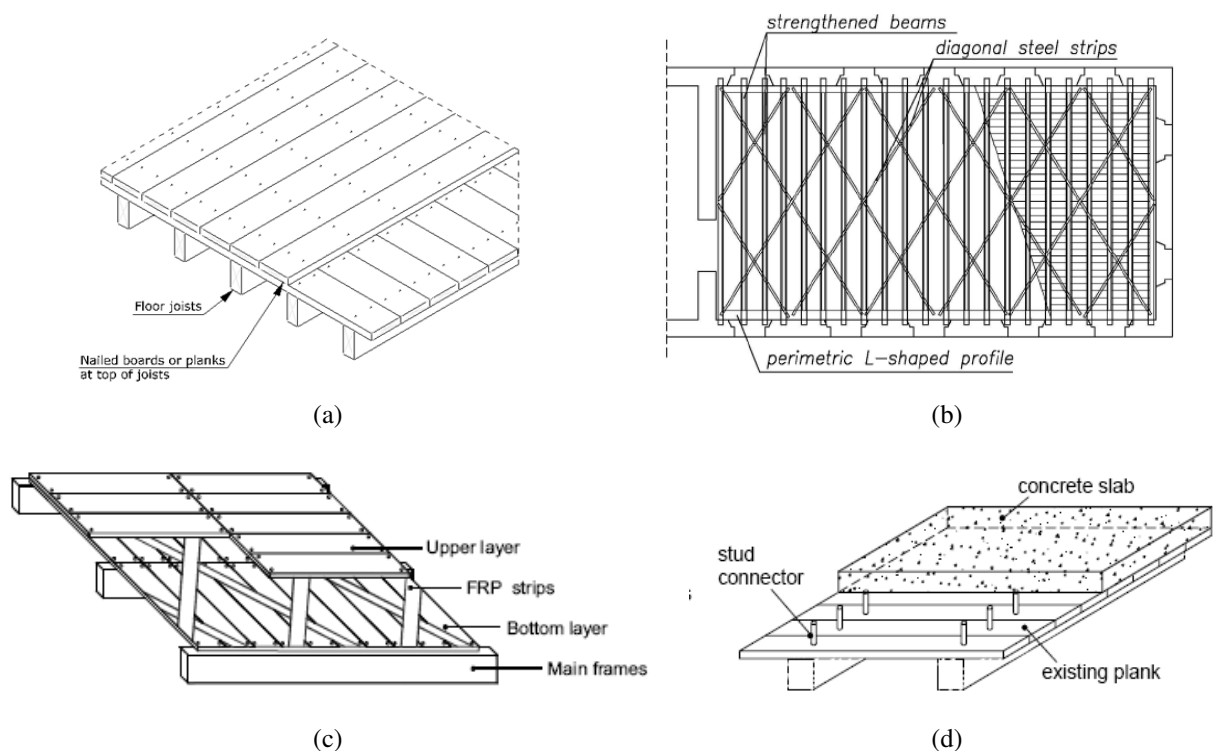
Stiffening to in-plane actions with, (a) timber, (b) steel, (c) FRP, (d) concrete.
